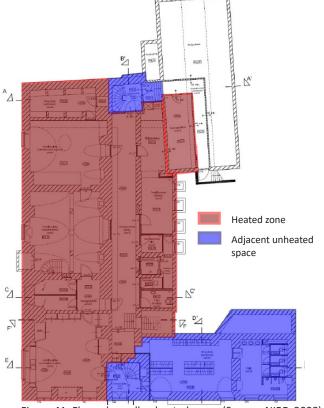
Floor plan cellar, heated zones (Source: NIBE, 2008)
